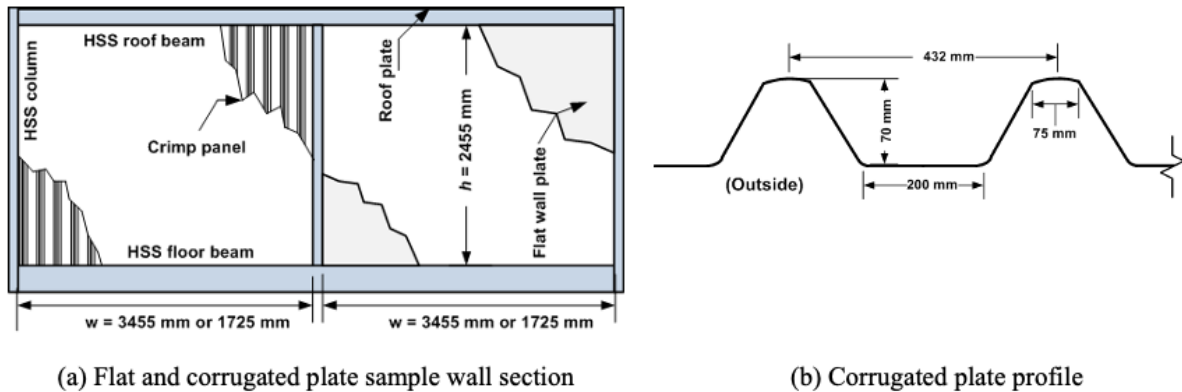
Wall plate (a) geometry and (b) corrugated plate profile.
